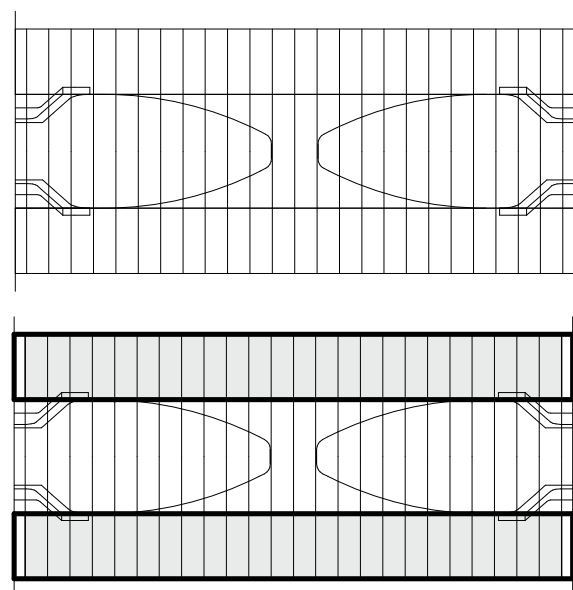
Preliminary design (on top) and final design (under) with prefabricated 'wings' in grey.
